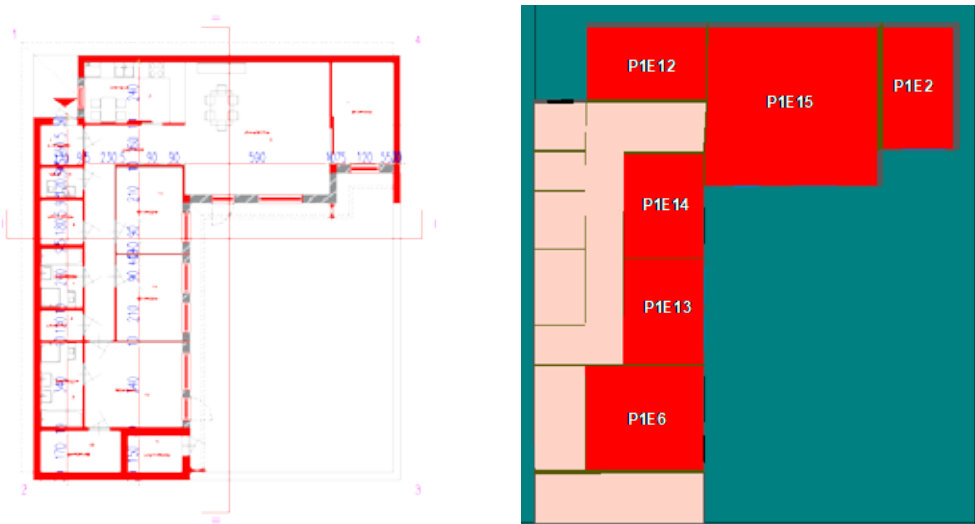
The plan of the residential house in AUTOCAD and HULC (Source: M.R.de Adana's private archive)
